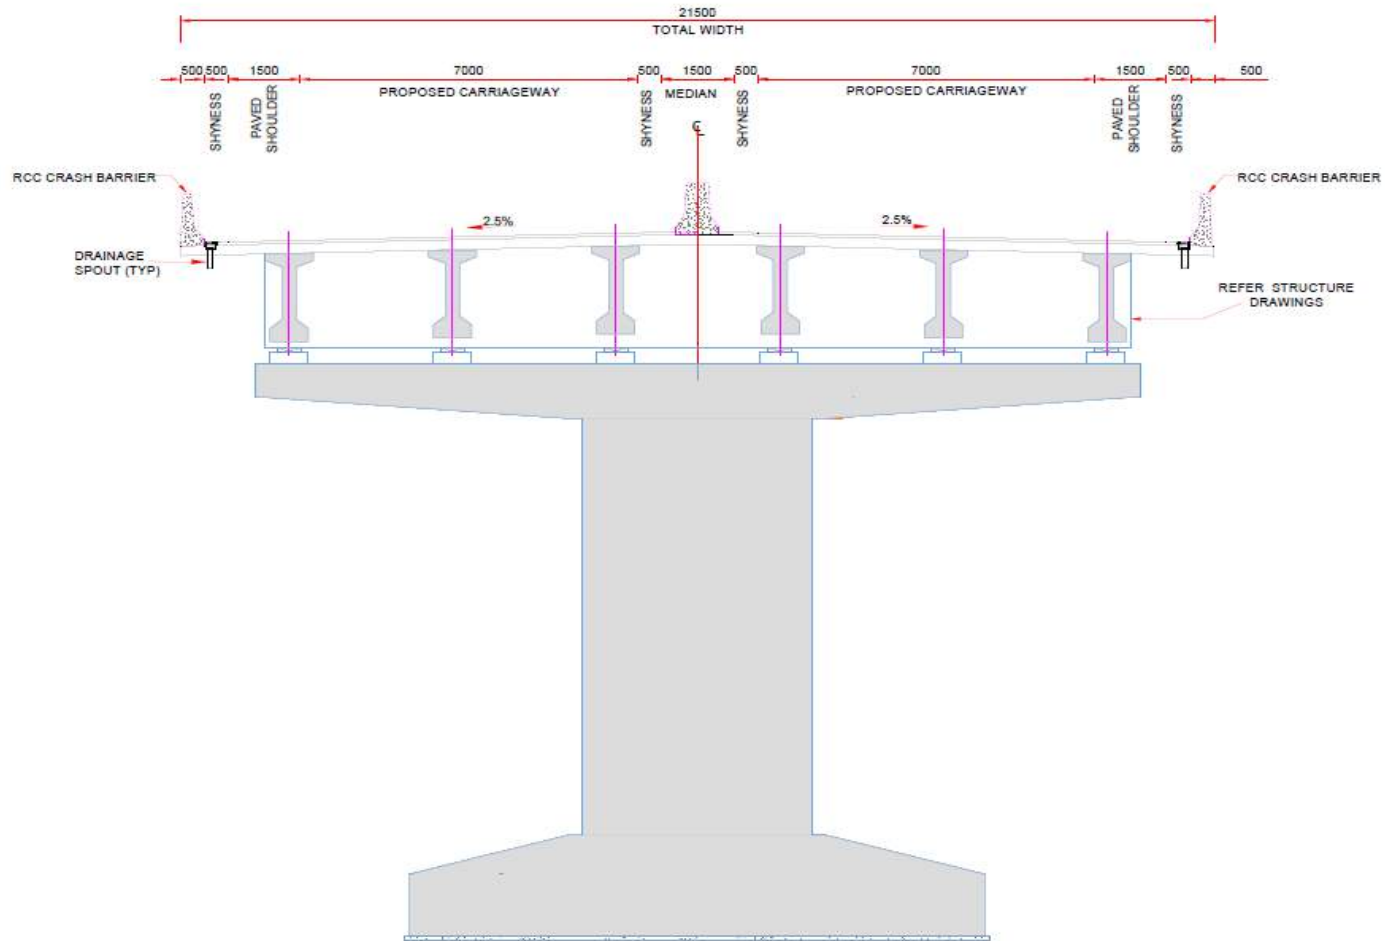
Proposed Elevated corridor from Yelahanka Old Town to Kempe Gowda International Airport road
